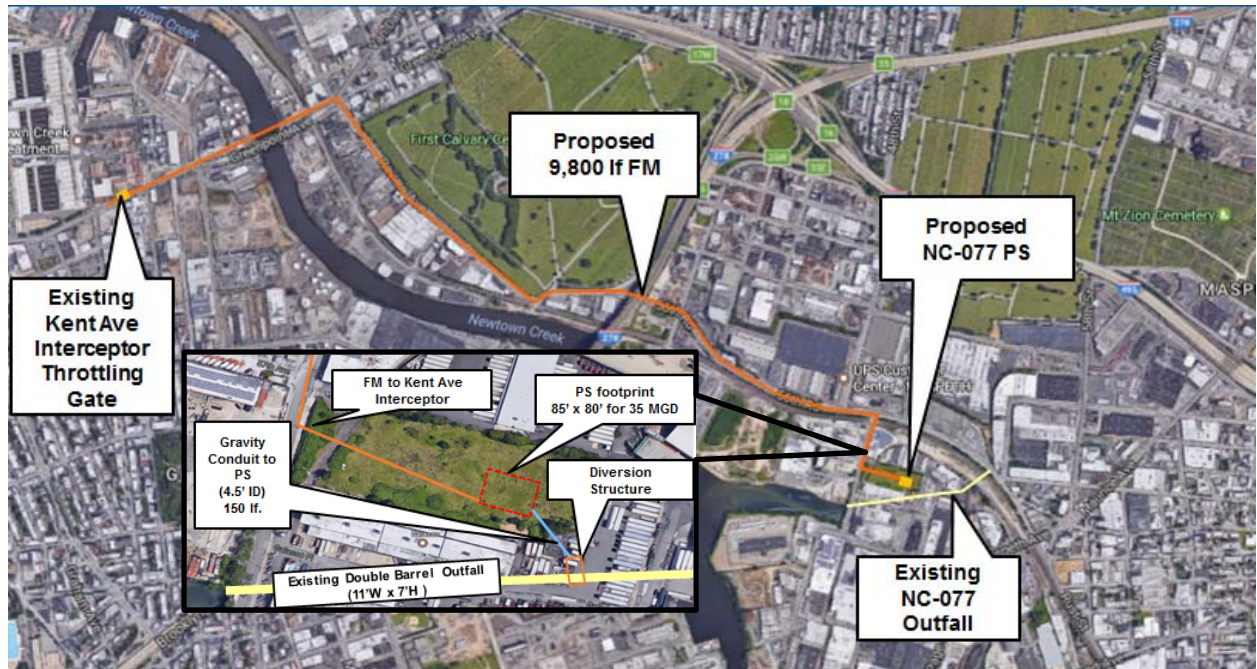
Layout of New Pumping Station at Outfall NC-077 part of Alternative CR-1
